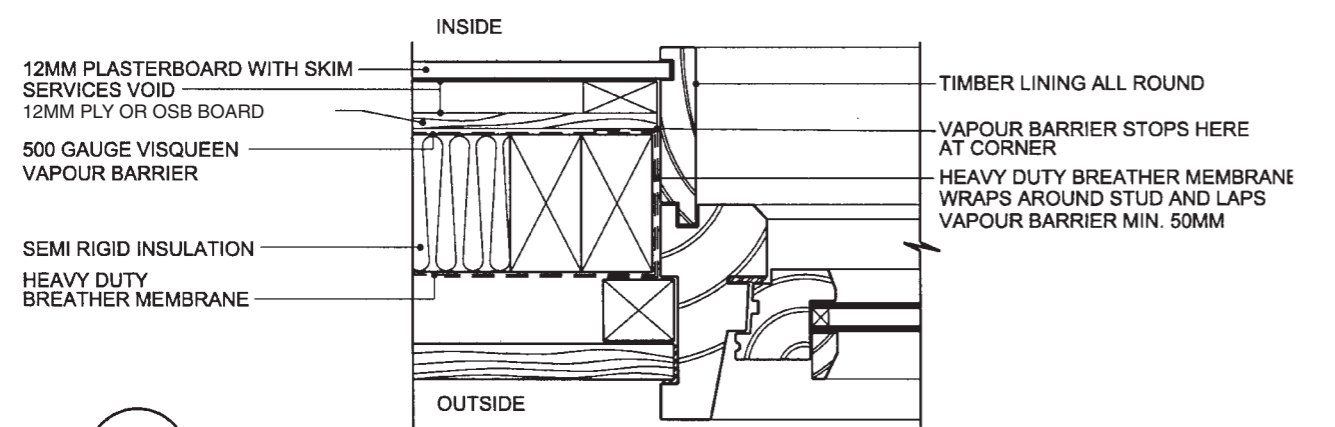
Breather Membrane (Site Fixed)
